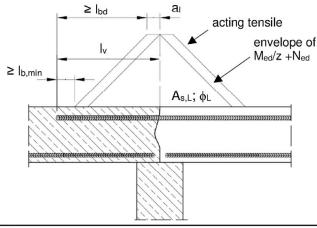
Overlapping joint at a foundation of a wall or column where the rebars are stressed in tension
